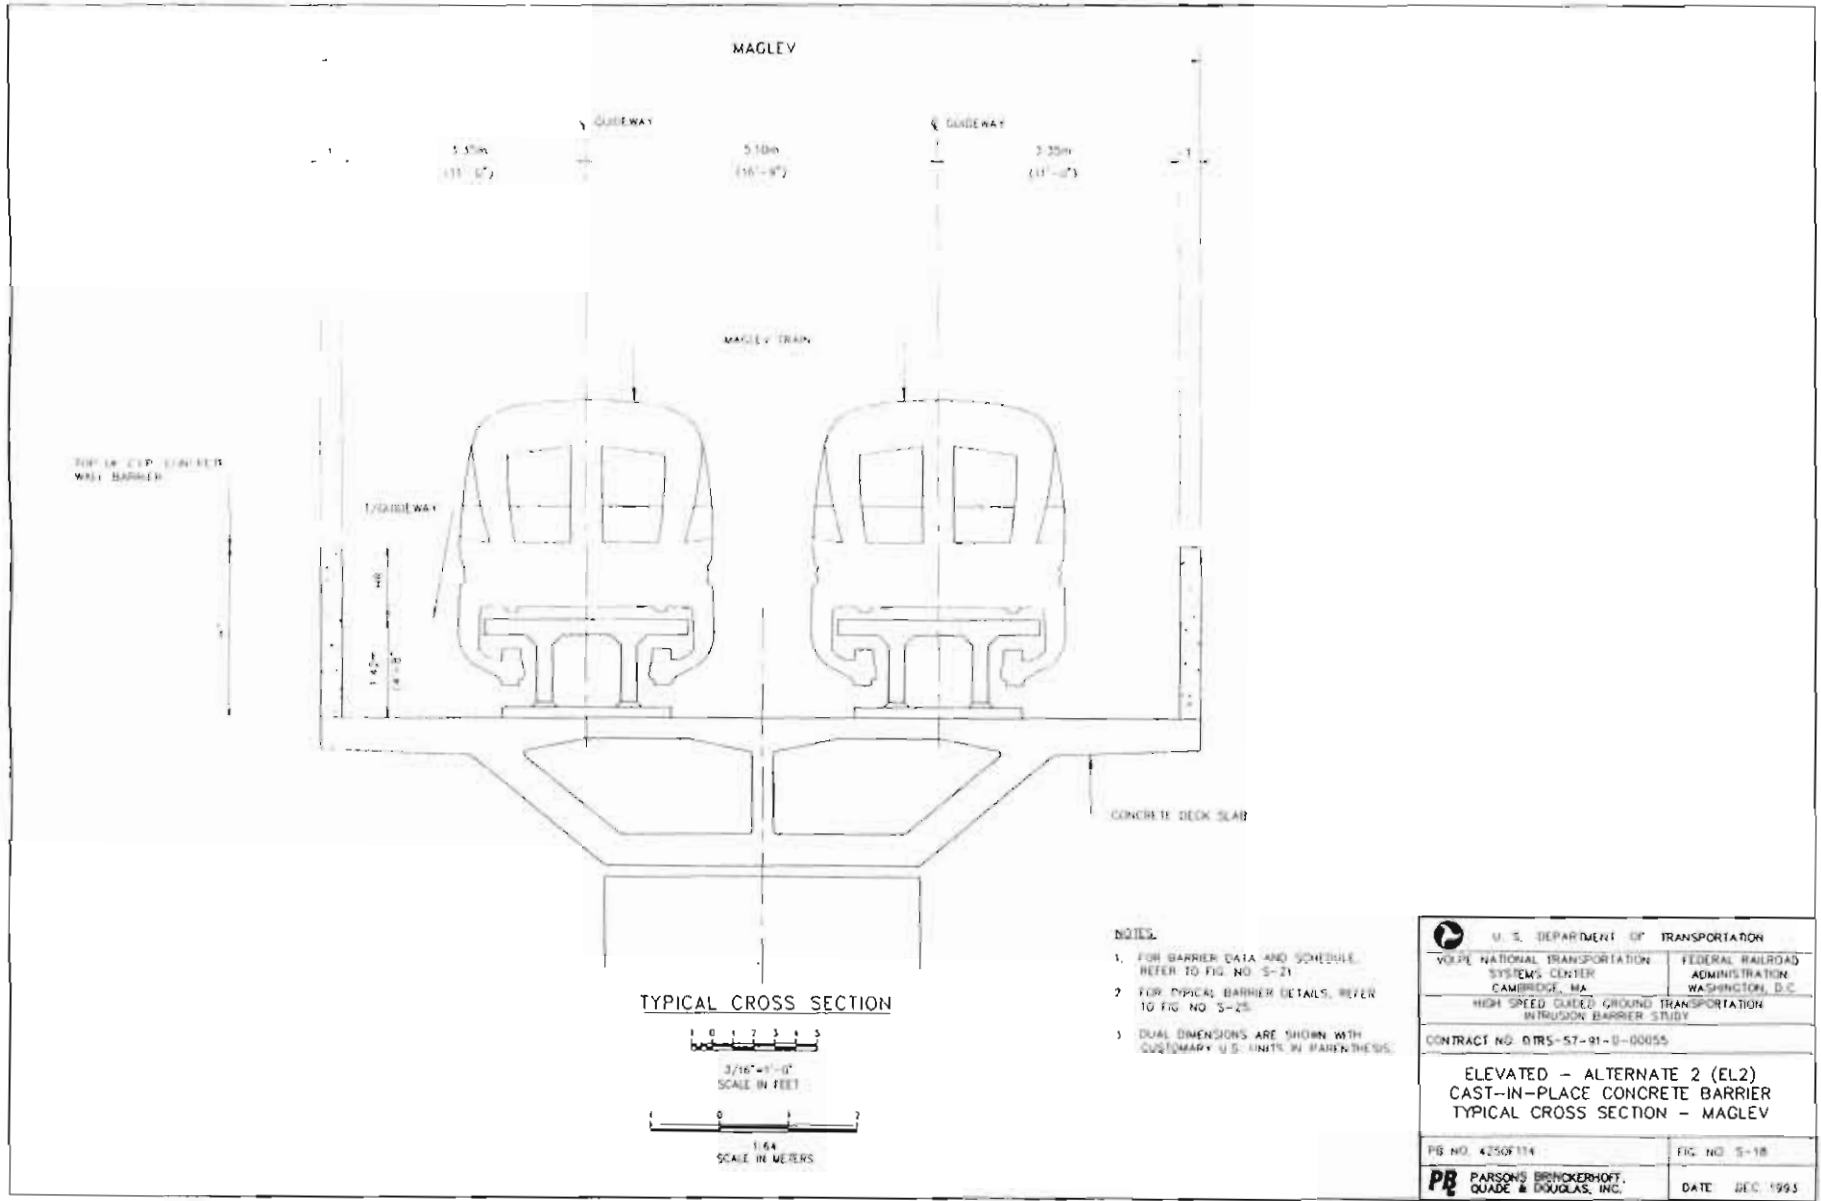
ELEVATED ALTERNATE 2: C.I.P. CONCRETE WALL - TRANSVERSE SECTION/MAGLEV
